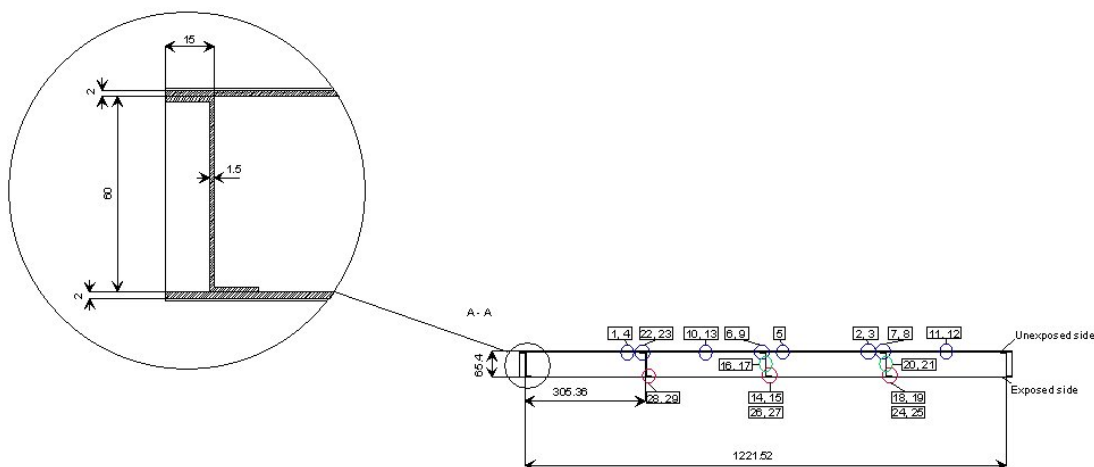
Wall structure test specimen: geometry and position of temperature measuring points
